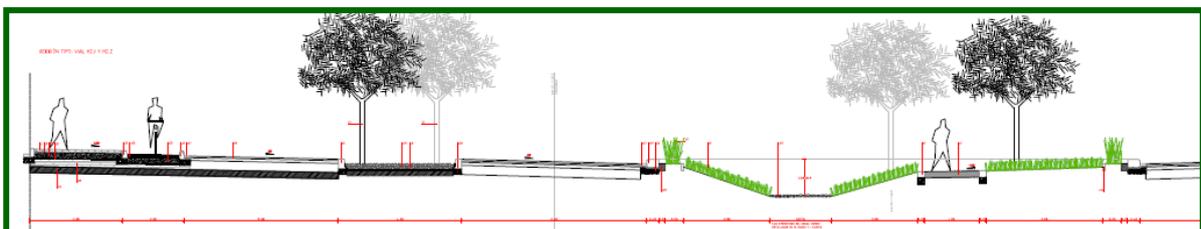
Cross section of the main road, integrating a current runoff corridor into the site layout
